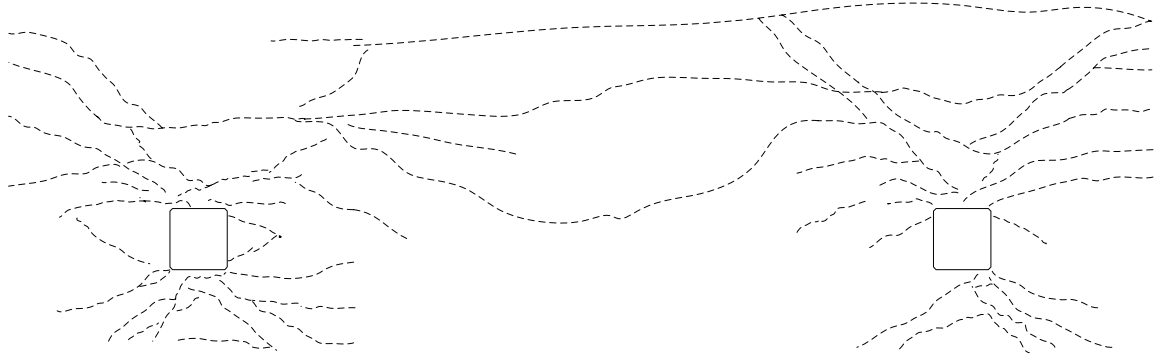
Level 3-2A and 2B Bottom Slab Cracks (North 3% Roof Drift)
